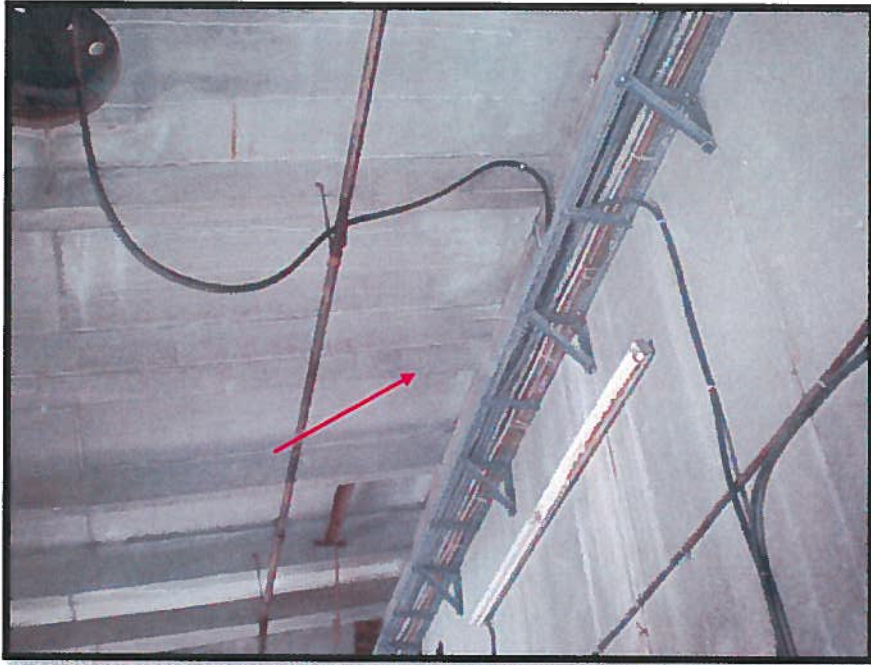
Asbestos-Containing Paper Beneath Transite Wall Panels, Generator Room (Sample 36).
